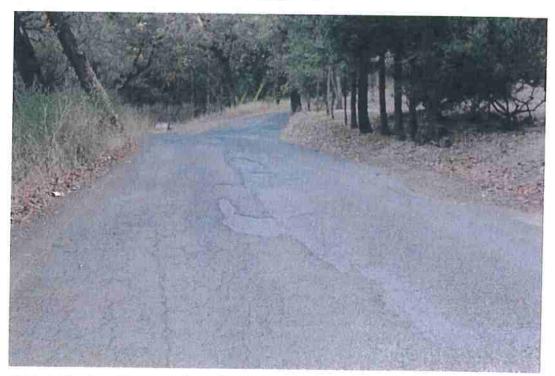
Mile 0.4: 18-ft road width with 1-ft shoulders.
